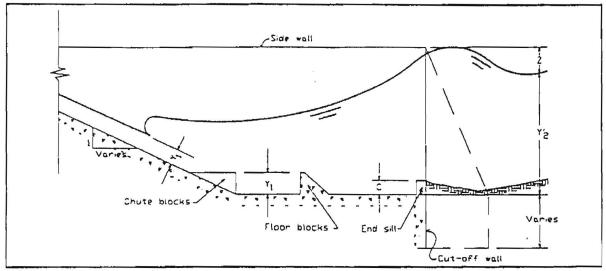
Center-Line Section of Rectangular SAF-Type Stilling Basin
